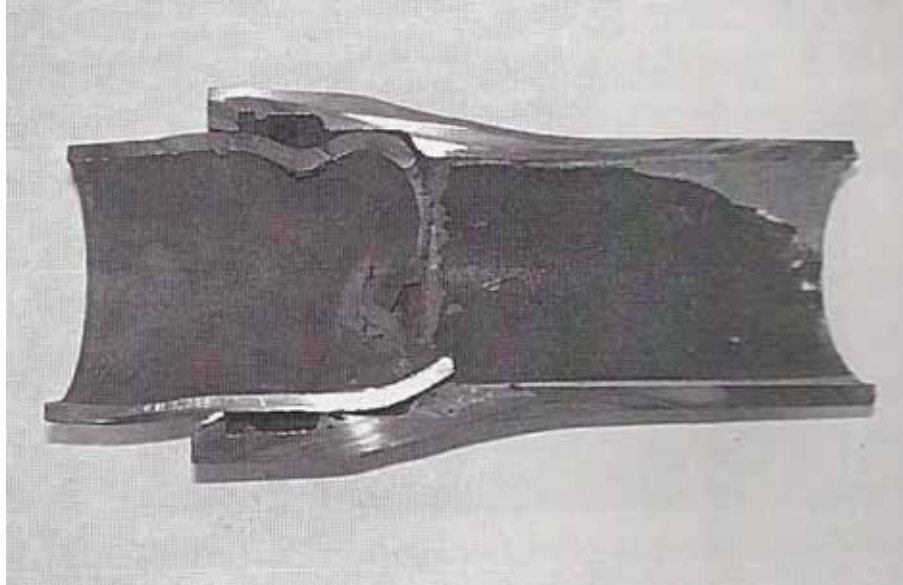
Ductile Iron Pipe Cross Section (After Failure)
